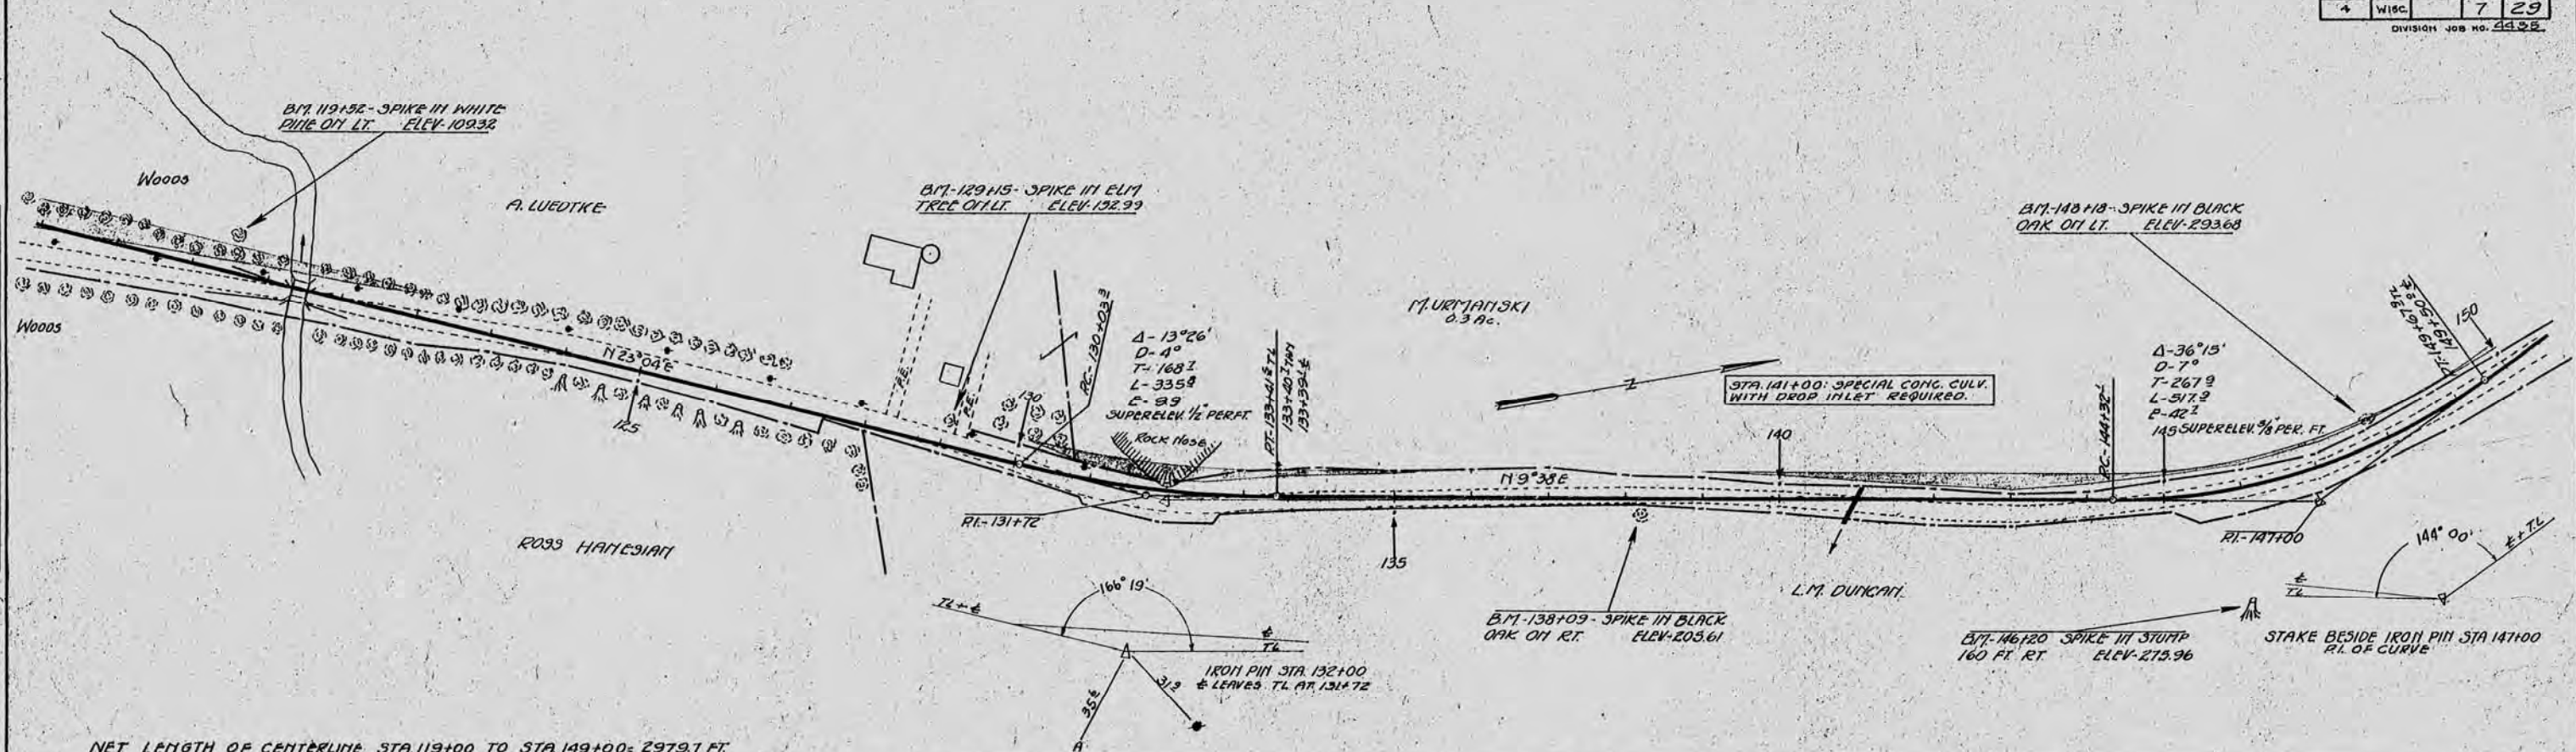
PLAN - PROFILE OF ROAD STANDARD
